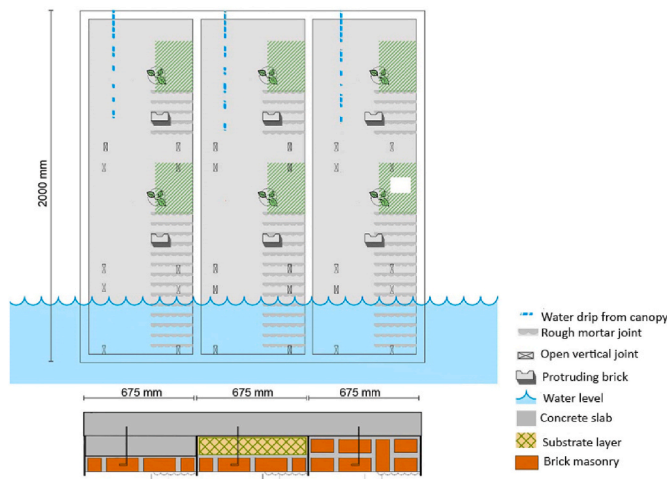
Schematic front view and horizontal section of a wall, with 3 vertical panels.
